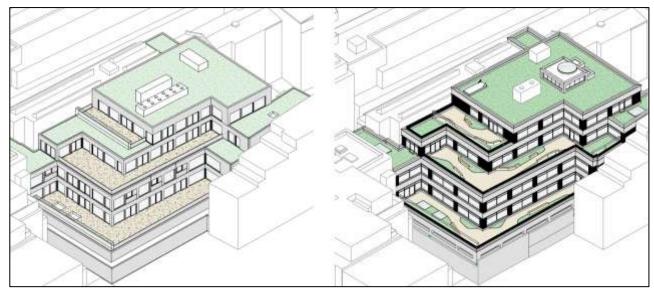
Layout of the rear of the building as approved (left) and proposed (right)
